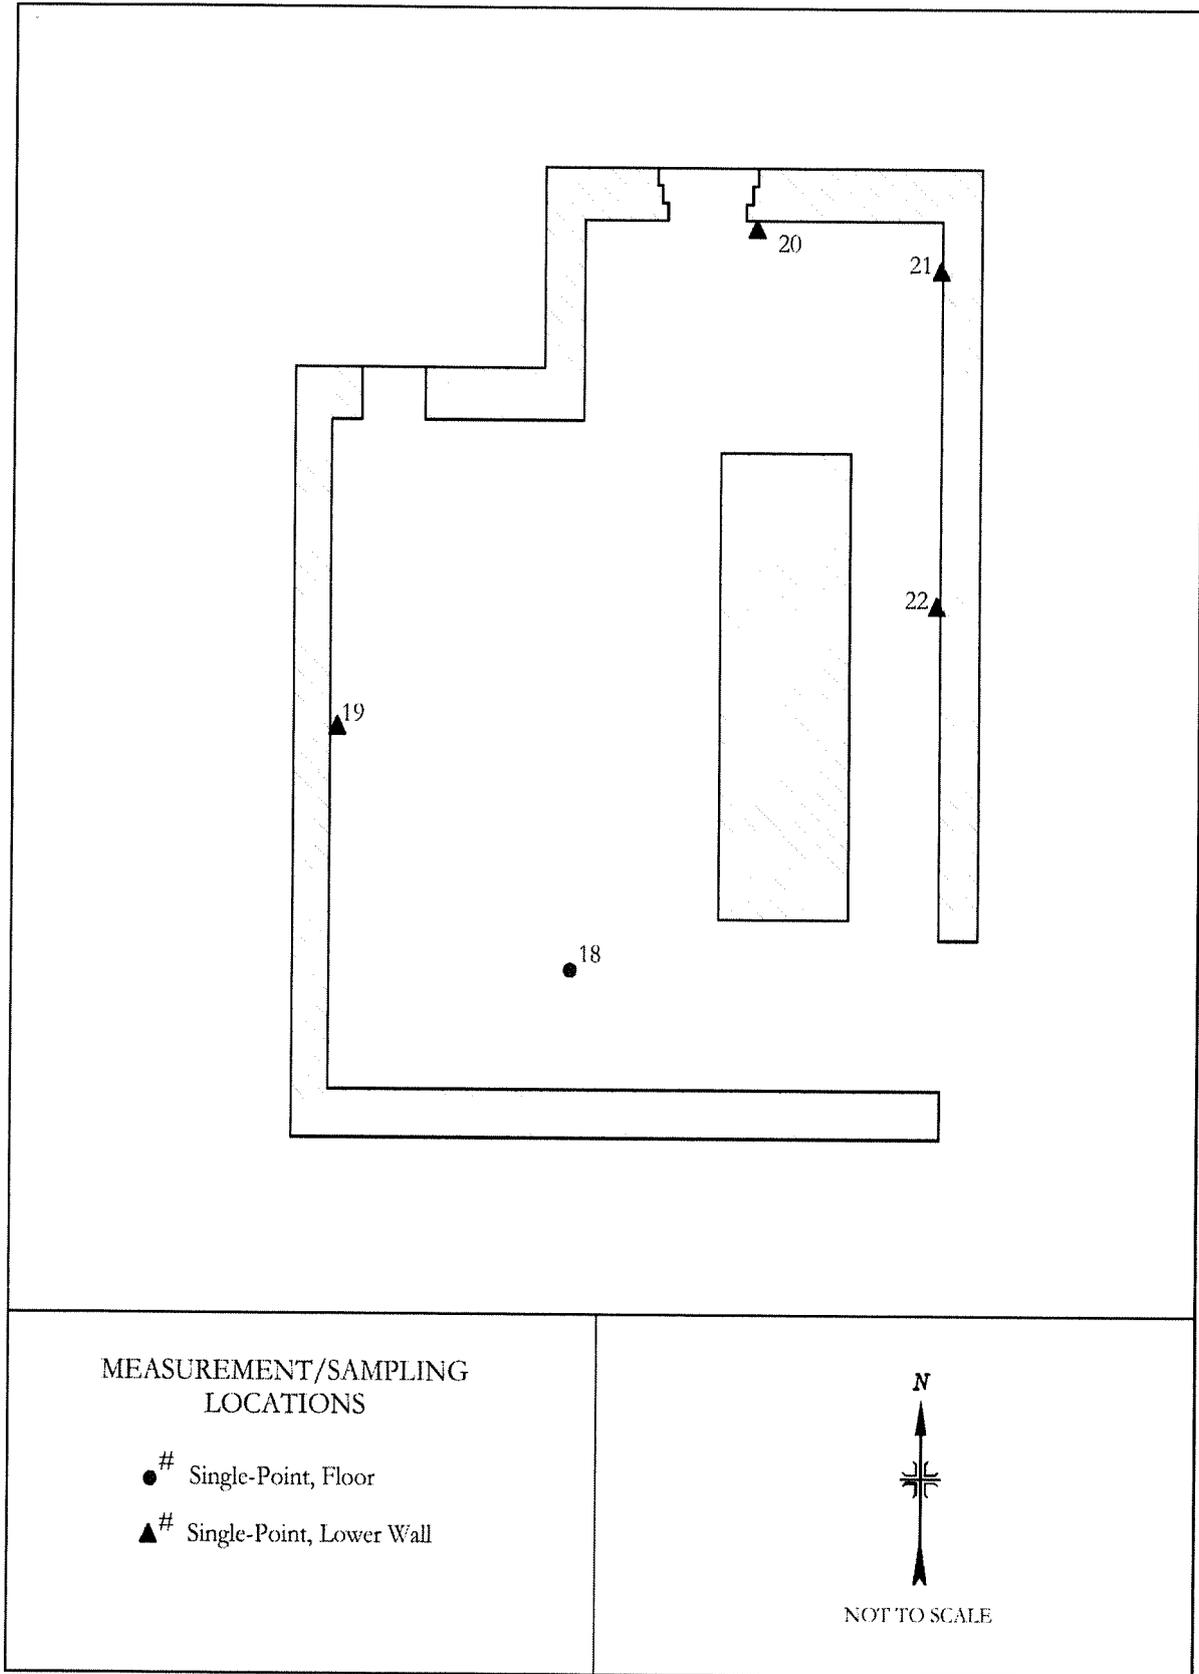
Auxiliary Building, Room 44 - Direct Measurement Locations
